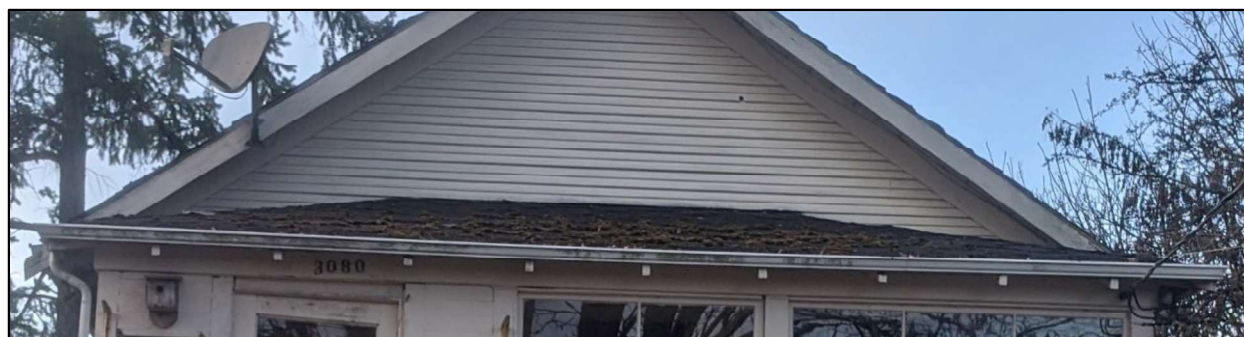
Front porch roof of 3080 Washington Avenue, highlighting its need for maintenance. (Source: Cummer, 2019)
